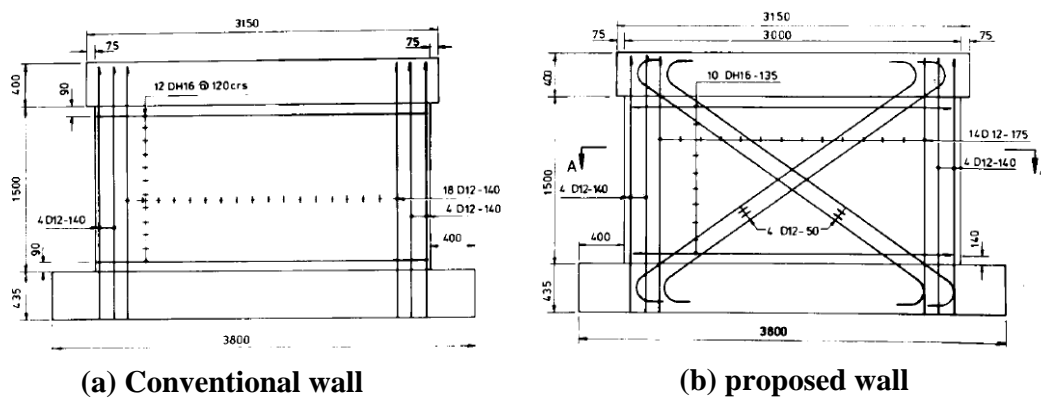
Reinforcement detailing of tested walls; dimensions mm (Paulay et al., 1982)
